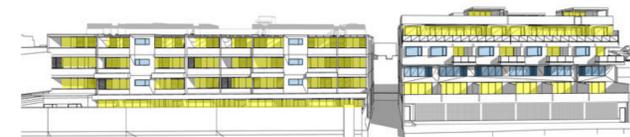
Solar access to adjacent dwellings - 74 Wyndham Street
